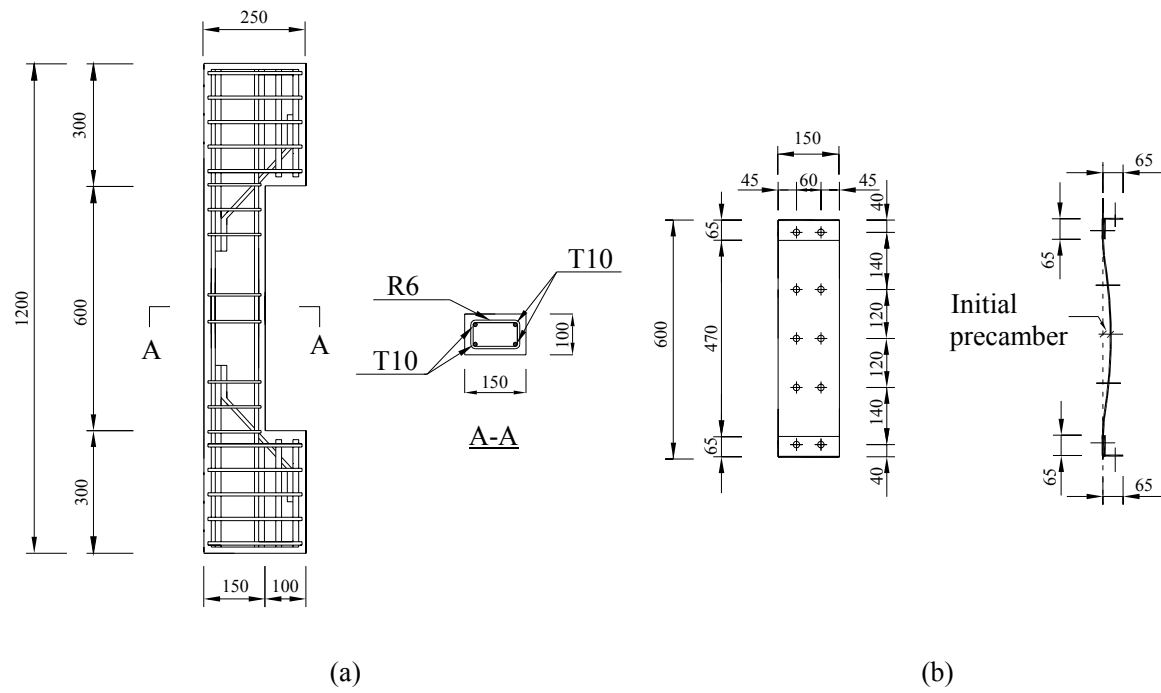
Reinforcement and precambered steel plates; (a) RC details; (b) Steel plate details
